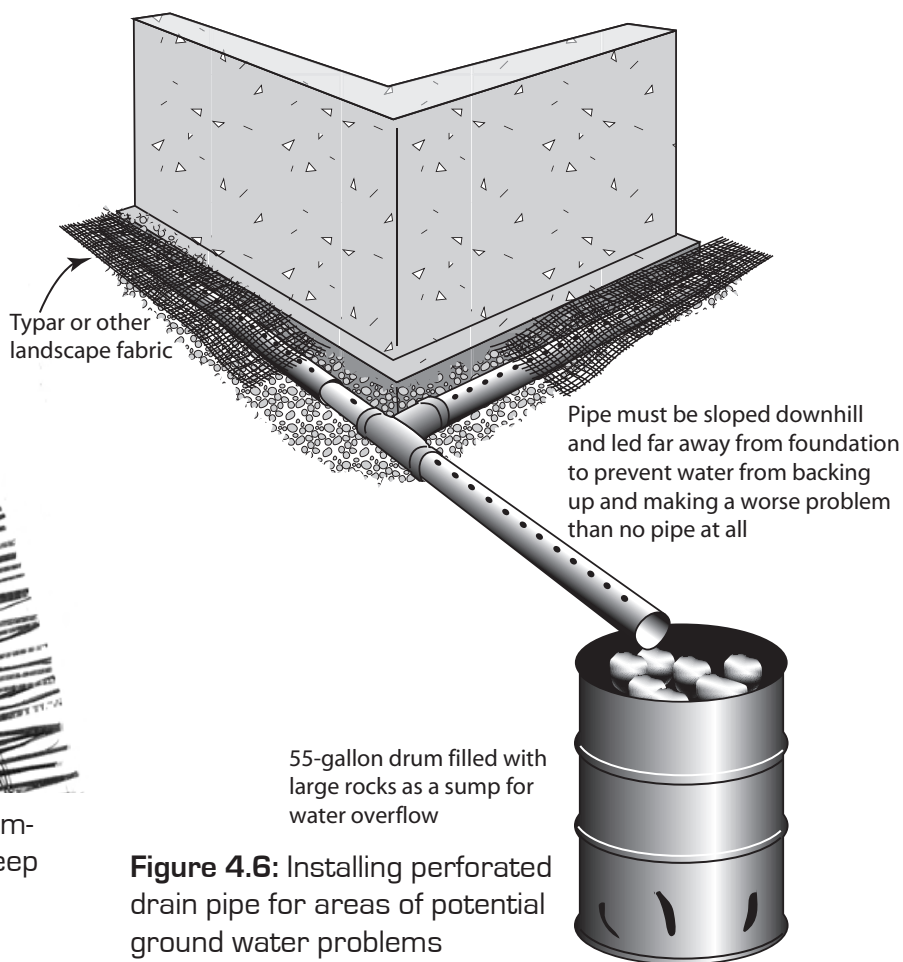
Installing perforated drain pipe for areas of potential ground water problems
